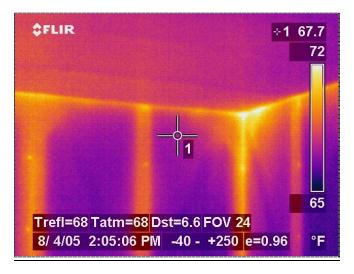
Thermal Image of Exterior, Steel-framed Walls
